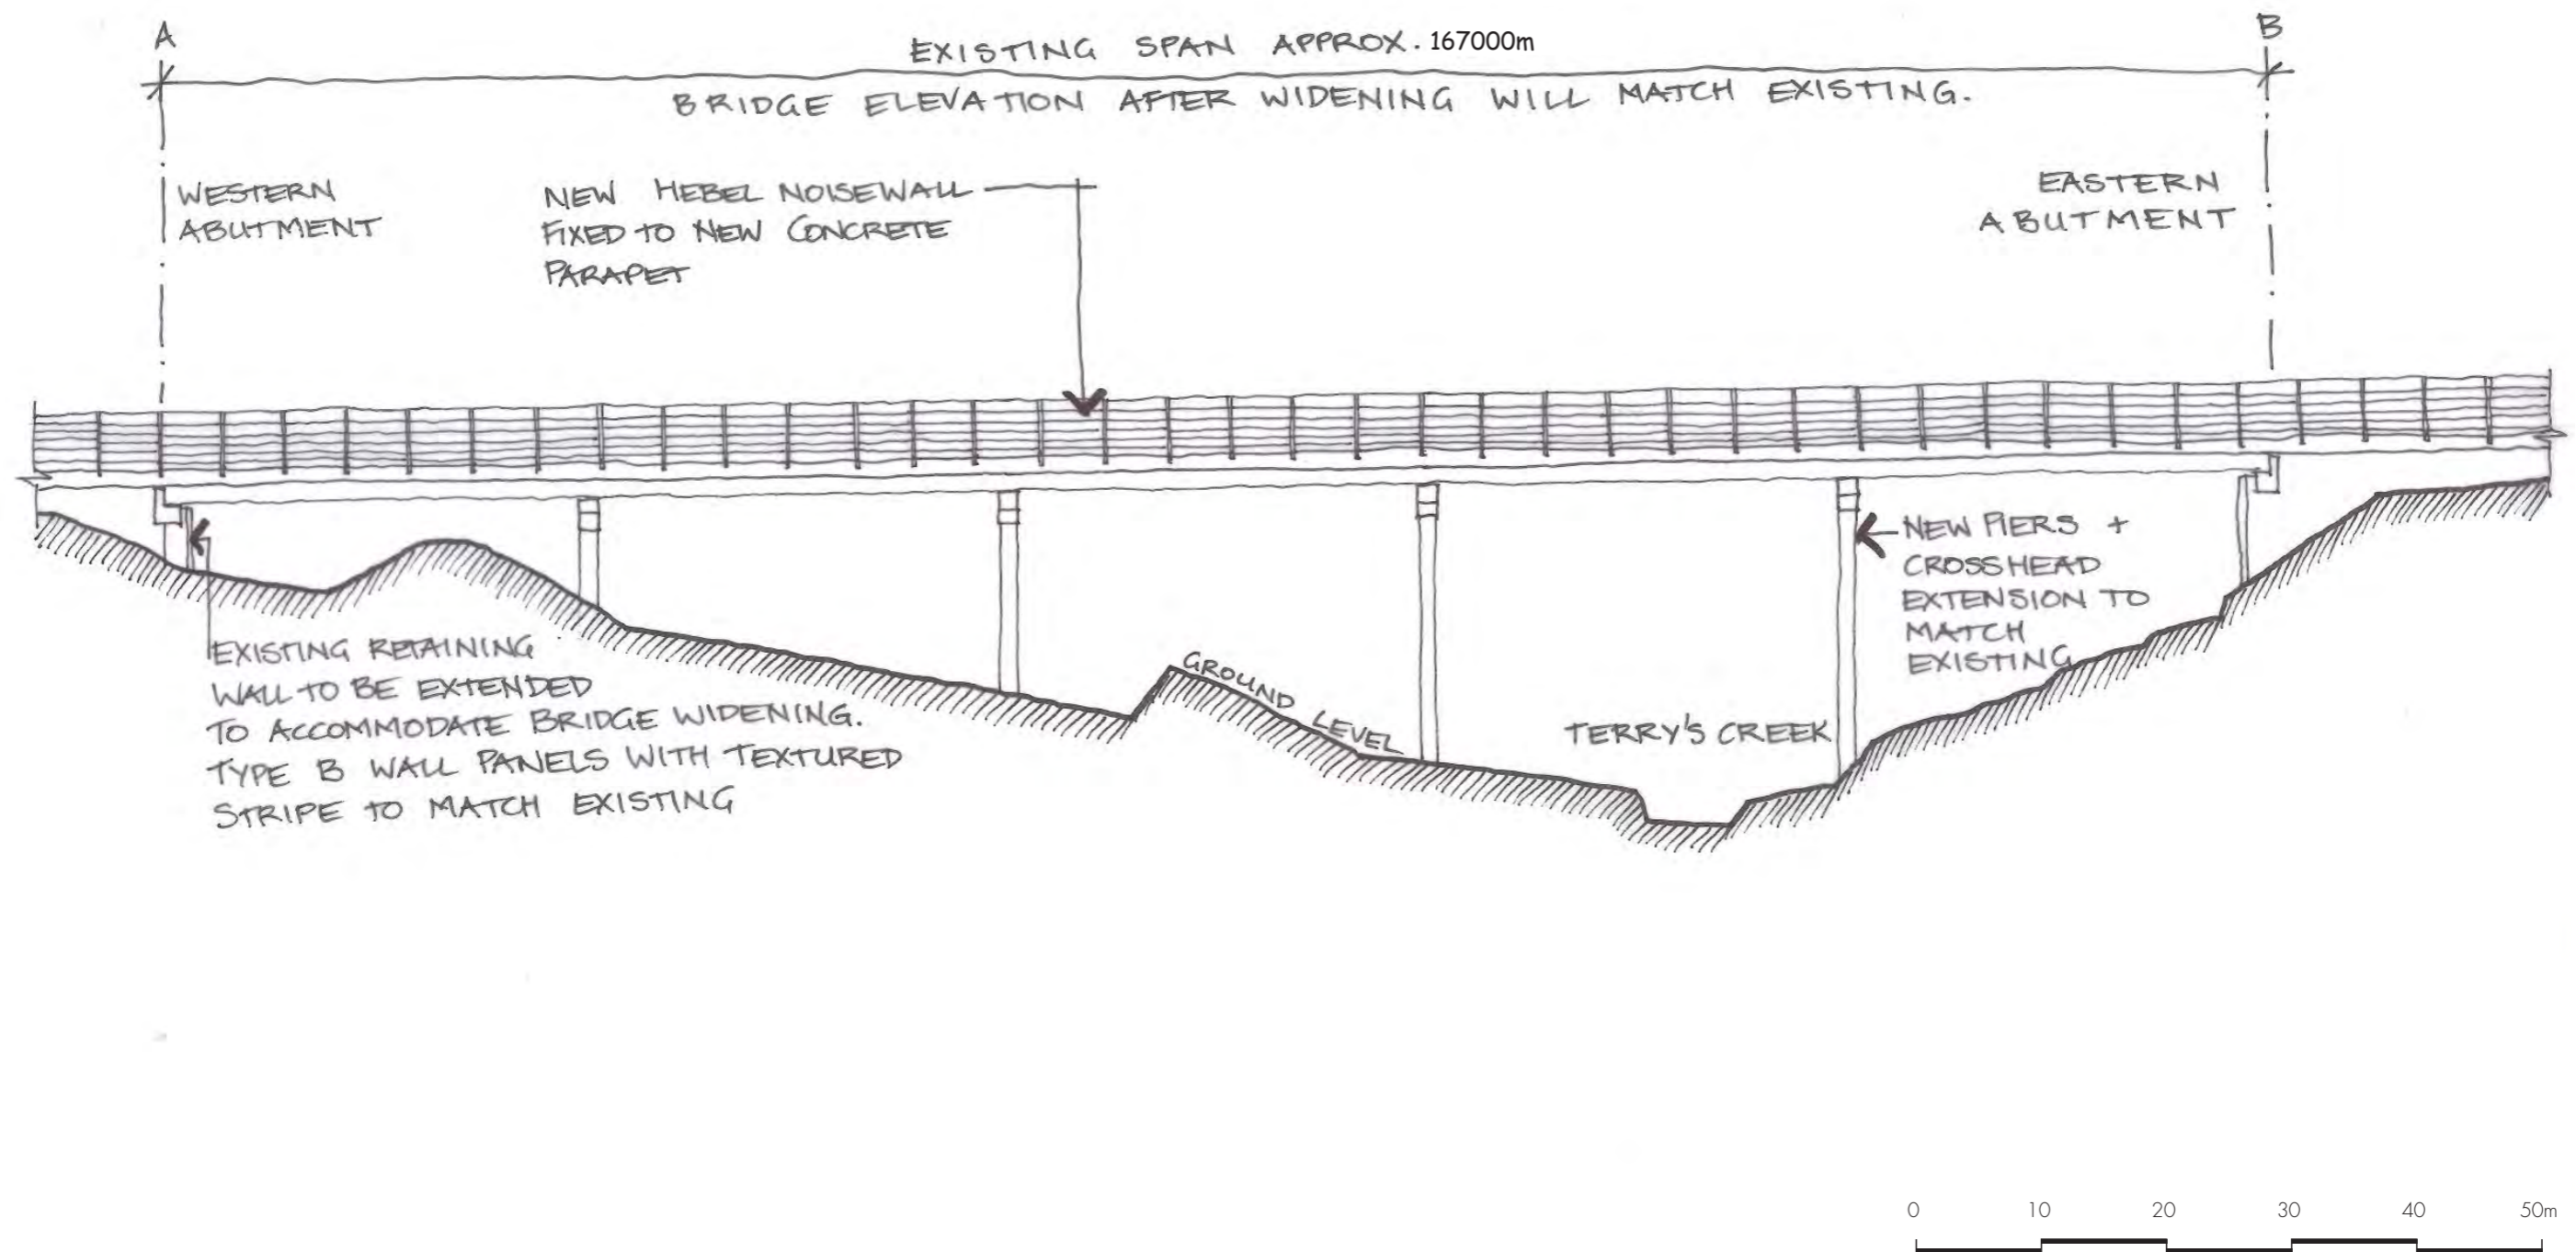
Bridge 4.1 Terry's Creek Bridge - Elevation
